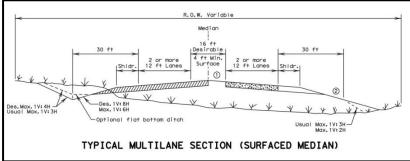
TYPICAL FREEWAY CROSS-SECTIONS
